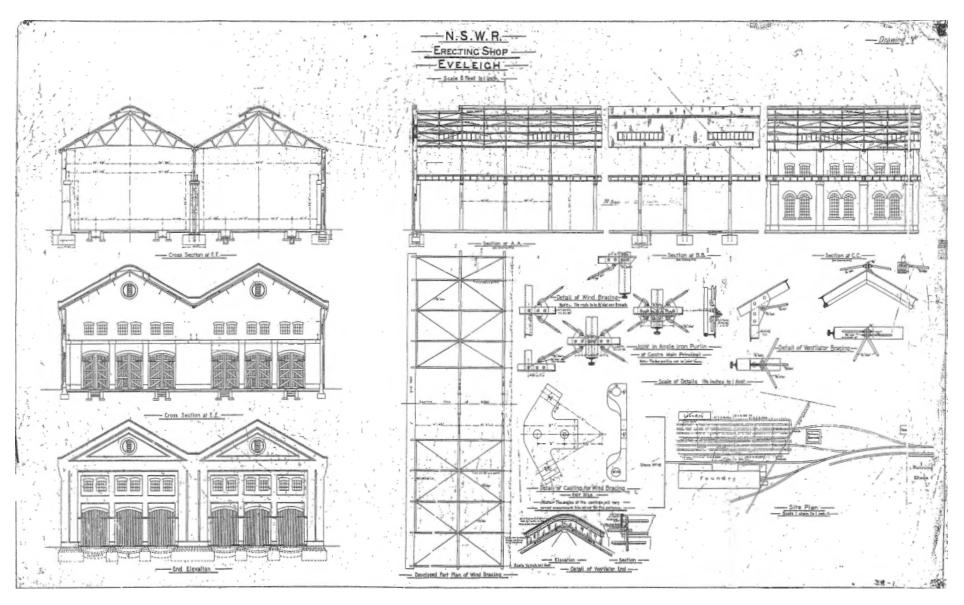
Drawings for the LES Building (formerly known as Erecting Shop), undated. Source: State Rail Authority, NSW State Archives, NRS-20550-2-24-COR/529P2, 38-1.
